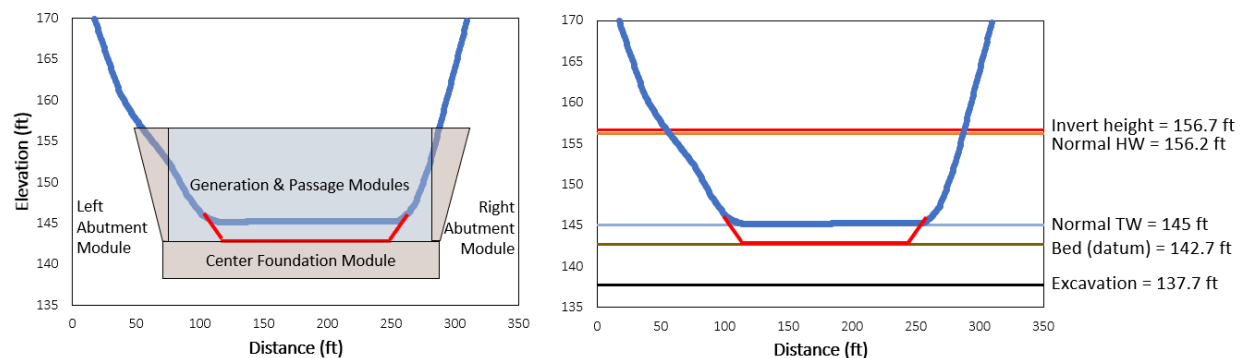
Elevation profile with modules in place (view is downstream to upstream).
